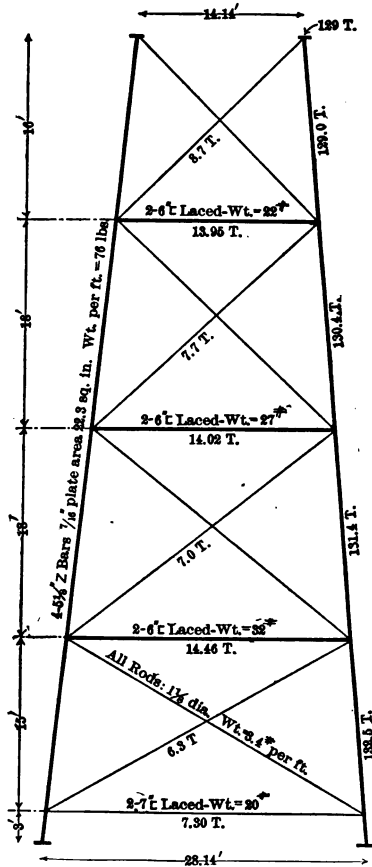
STRESS DIAGRAM.—70-FT. TOWER; 20 X 42-FT. TANK.
